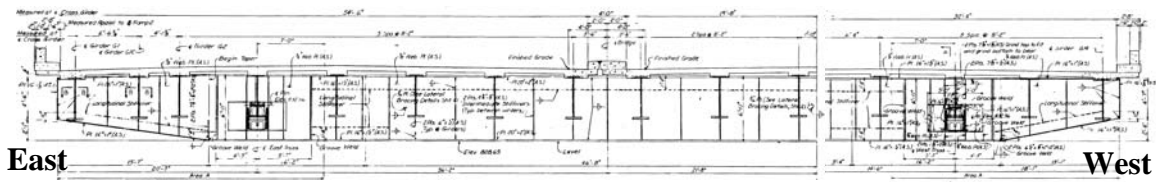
Plate girders in north approach span (from Mn/DOT 2008, continued).
